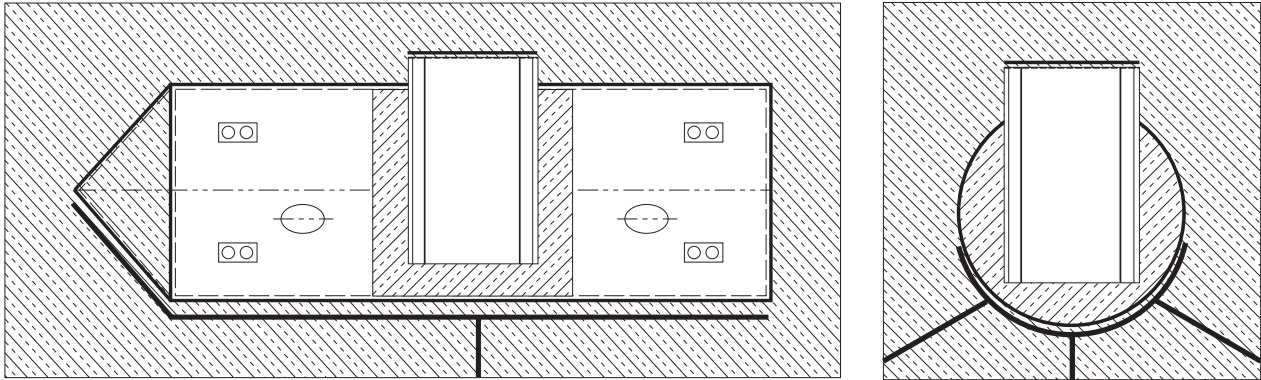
Schematic depiction of providing support and capping the entire pontoon with concrete ([77] and this report).
